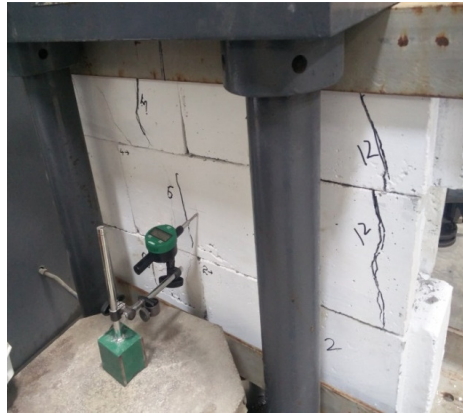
General view of interlocking concrete block wall for axial loading (UDL)
